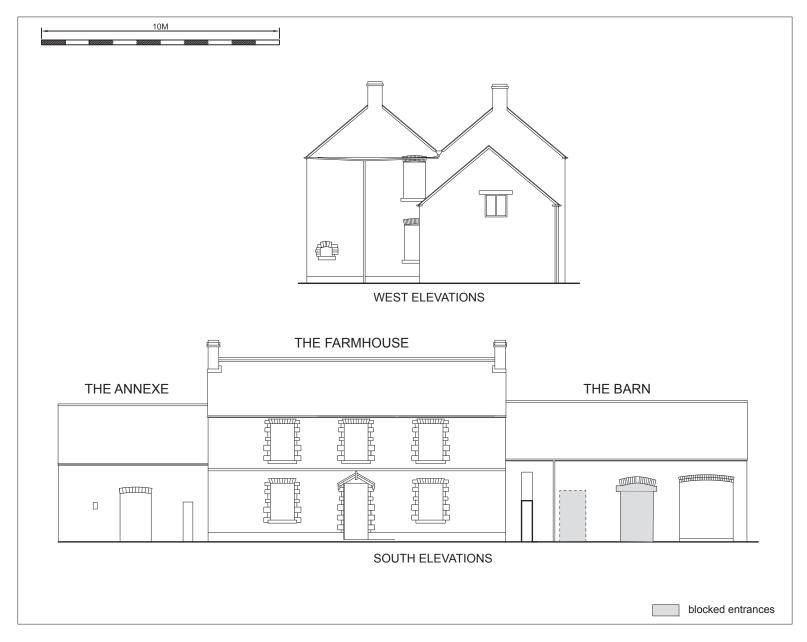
South and West elevations of Dairy Farmhouse and adjoining buildings
